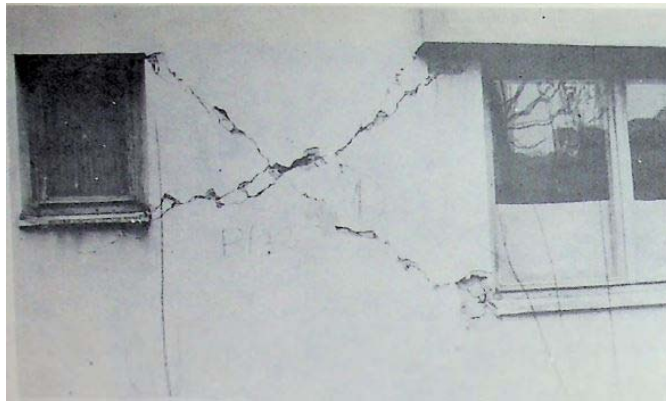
Masonry wall at the ground floor of a GF+4 building [8]
